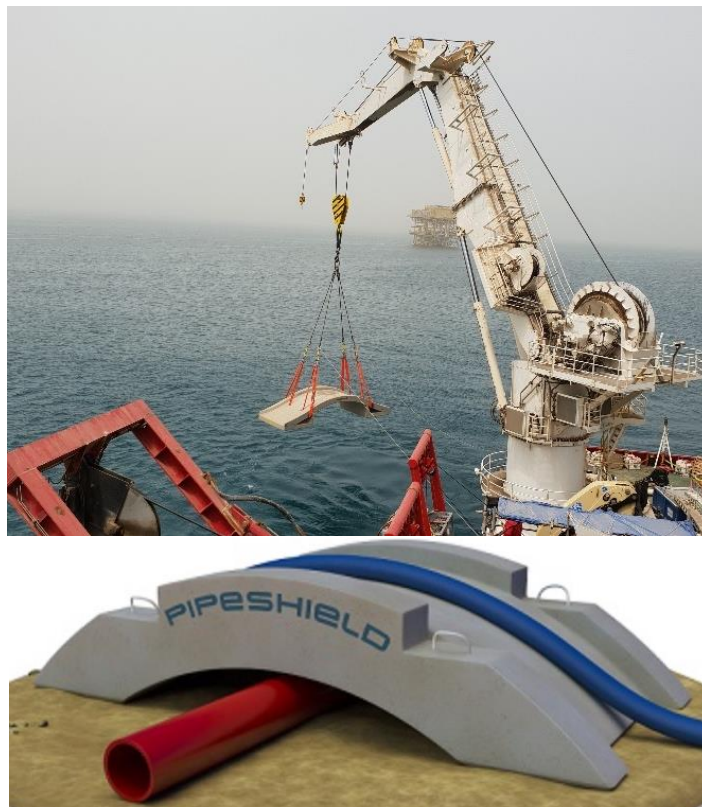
Method for constructing and laying concrete structures on a cable line [Source: pipeshield.com]
